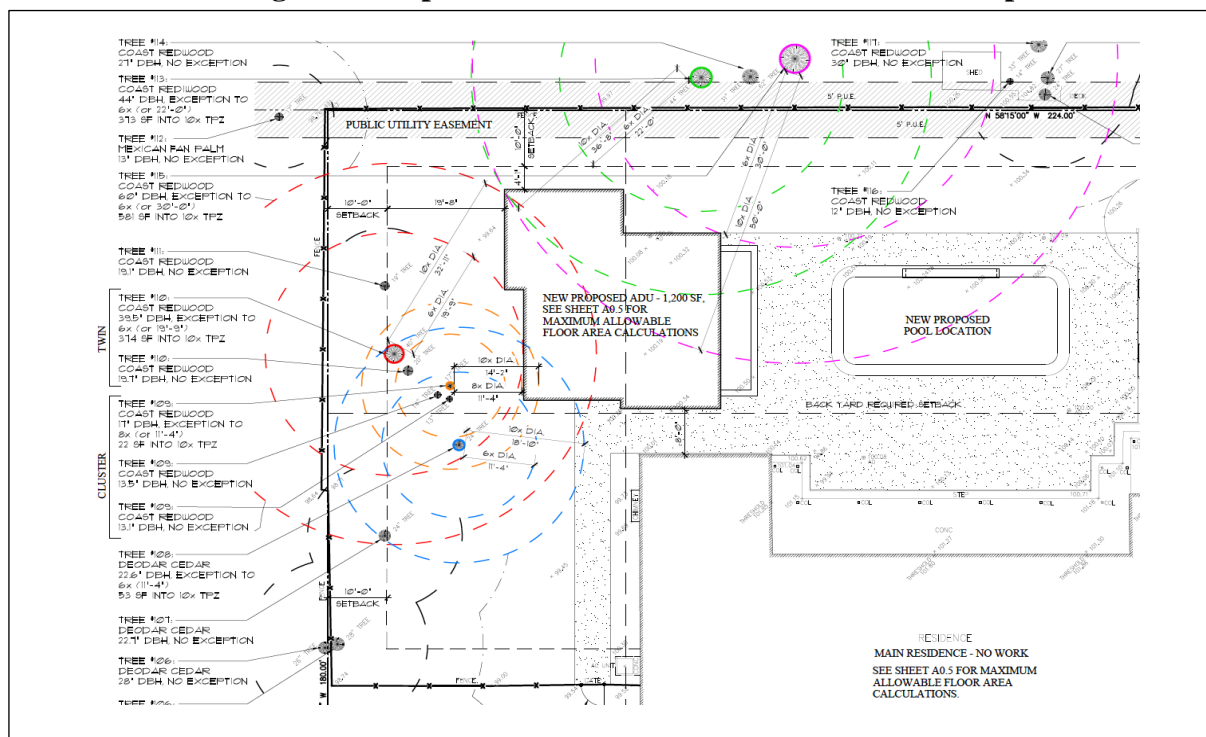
Existing & Proposed Conditions – Partial Site Plan
